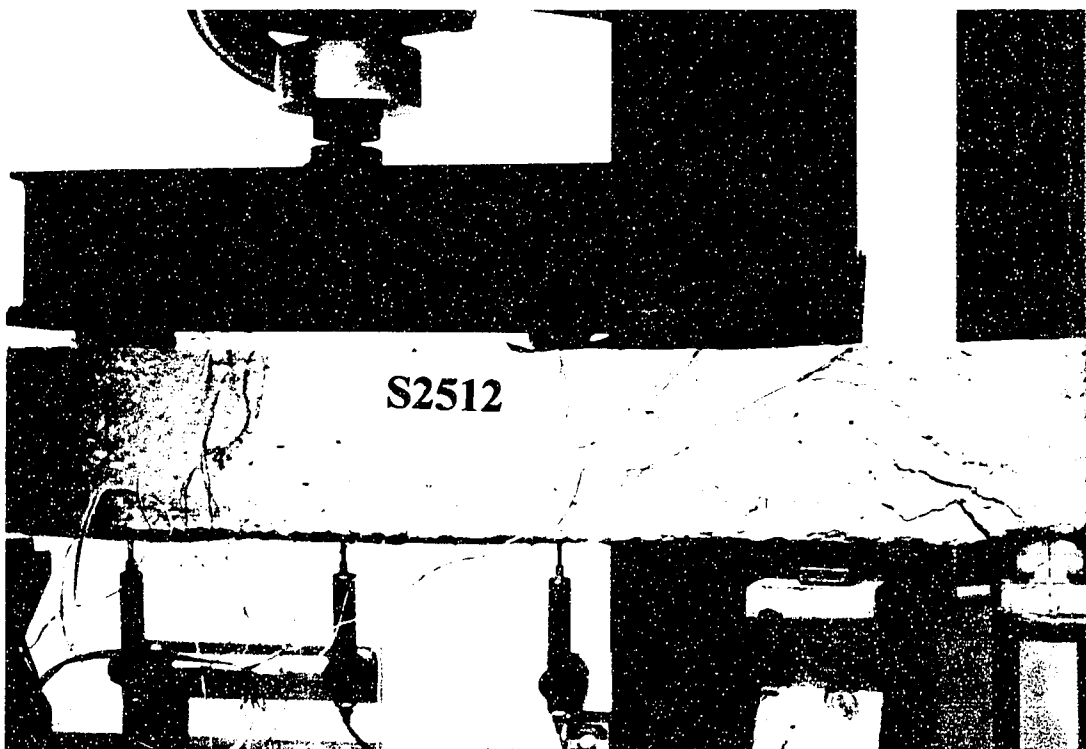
Photograph showing the mode of failure for beam S2512 strengthened by 2 mm thick, 100 mm wide and 1100 mm long plate with 120 mm c/c spacing of stirrups
